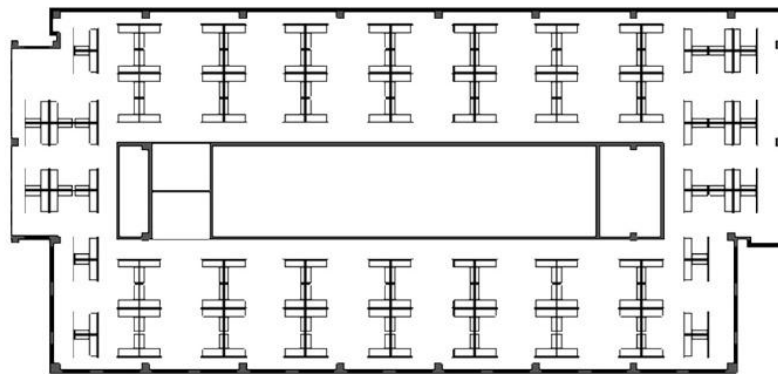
Layout #2: Desks Parallel to Windows-Bridge Layout
